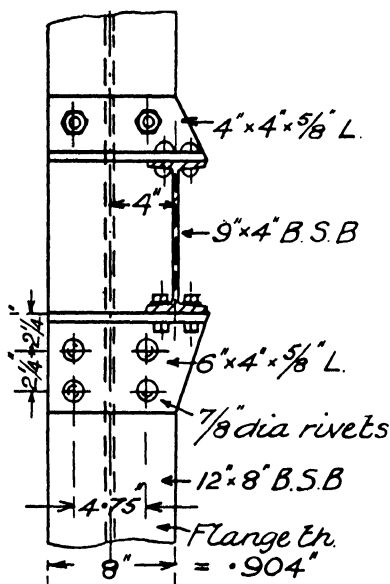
ECCENTRIC CONNECTION OF BEAM AND STANCHION.
